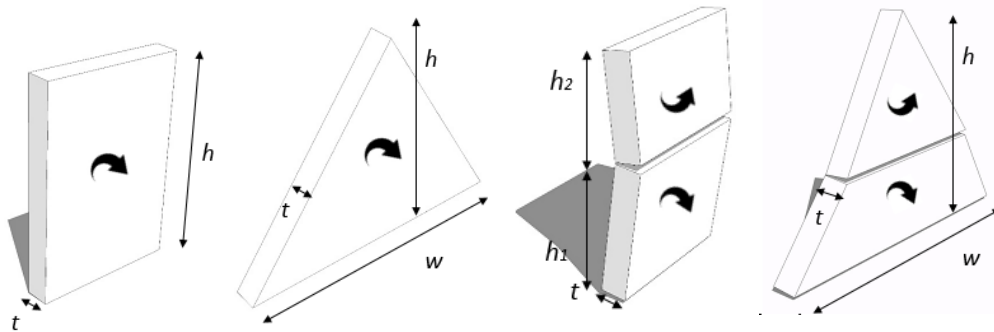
Geometrical property variation for parametric study of non-structural parapet, gable and façade walls
